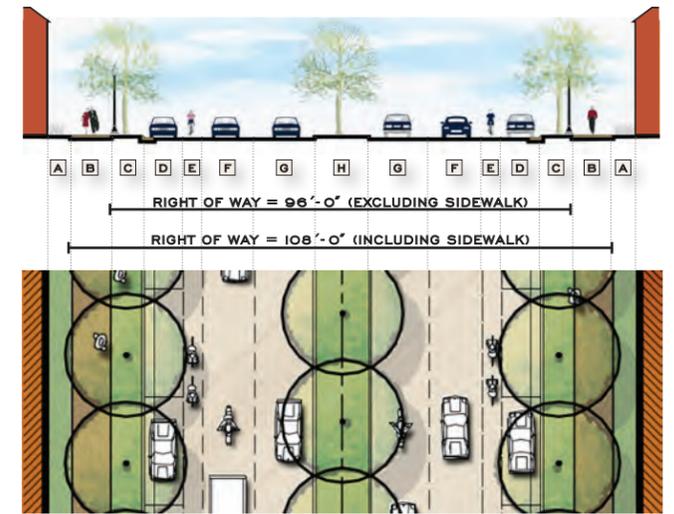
Boswell's Corner Street Section & Plan – Telegraph Road (VA-637)
